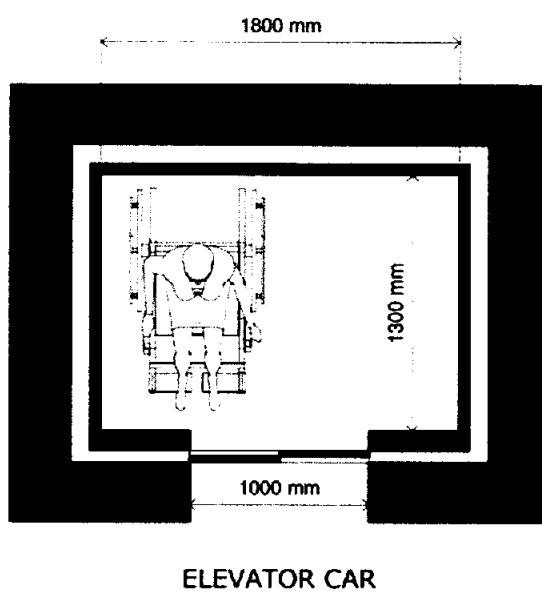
Illustration of minimum dimensions of an accessible elevator, particularly in heavy usage areas.
